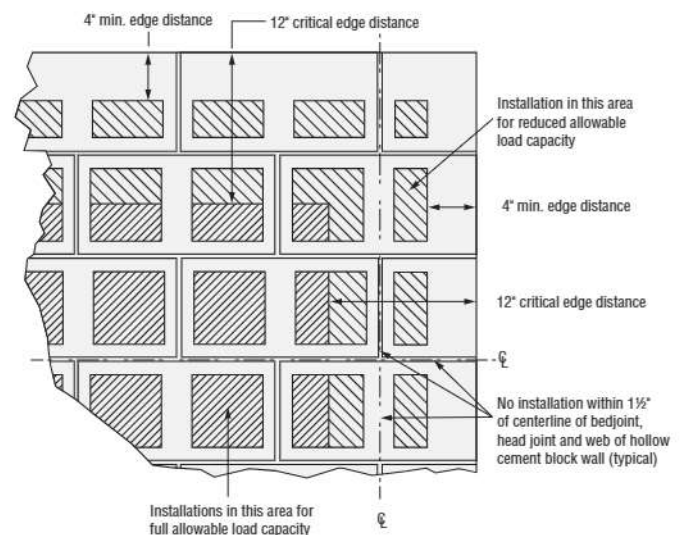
Allowable Anchor Locations for Full and Reduced Load Capacity When Installation Is in the Face of Hollow CMU Masonry Wall Construction
